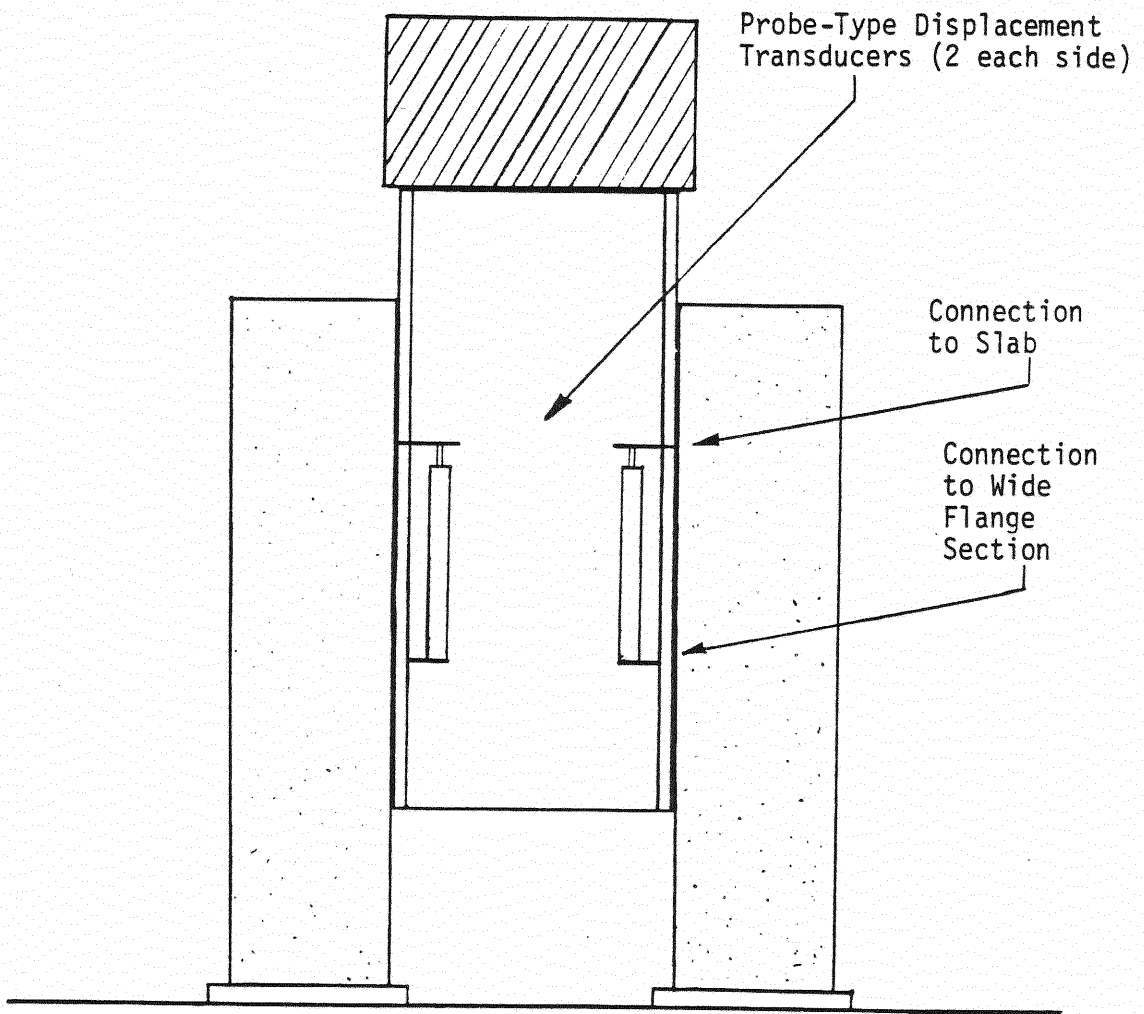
Instrumentation for Shear Connector Specimen Failure Test
